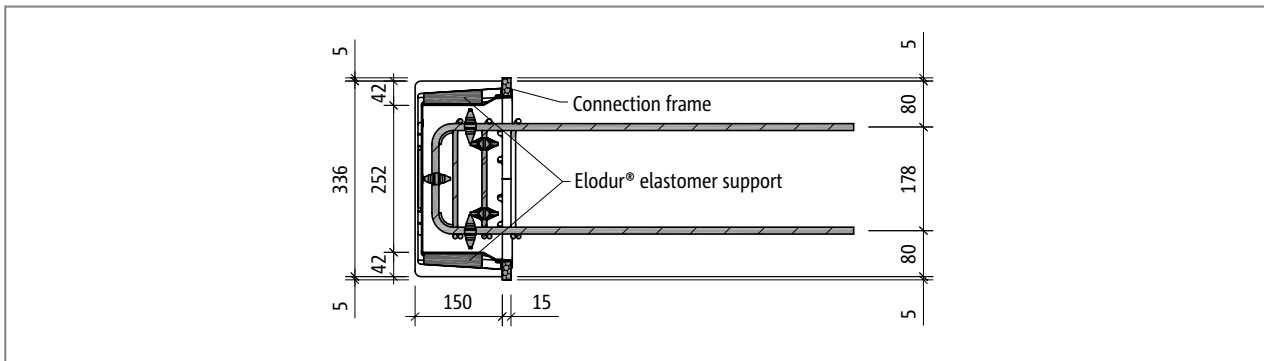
Schöck Tronsole® type Z-VH+VH-T: Horizontal cross-section
